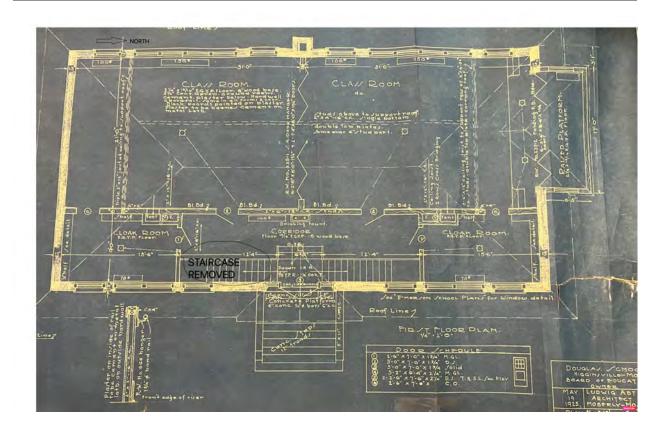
Blueprint main floor Douglass School. Source: Louis Abt, 1925 (current floor plan) (p. 4)
